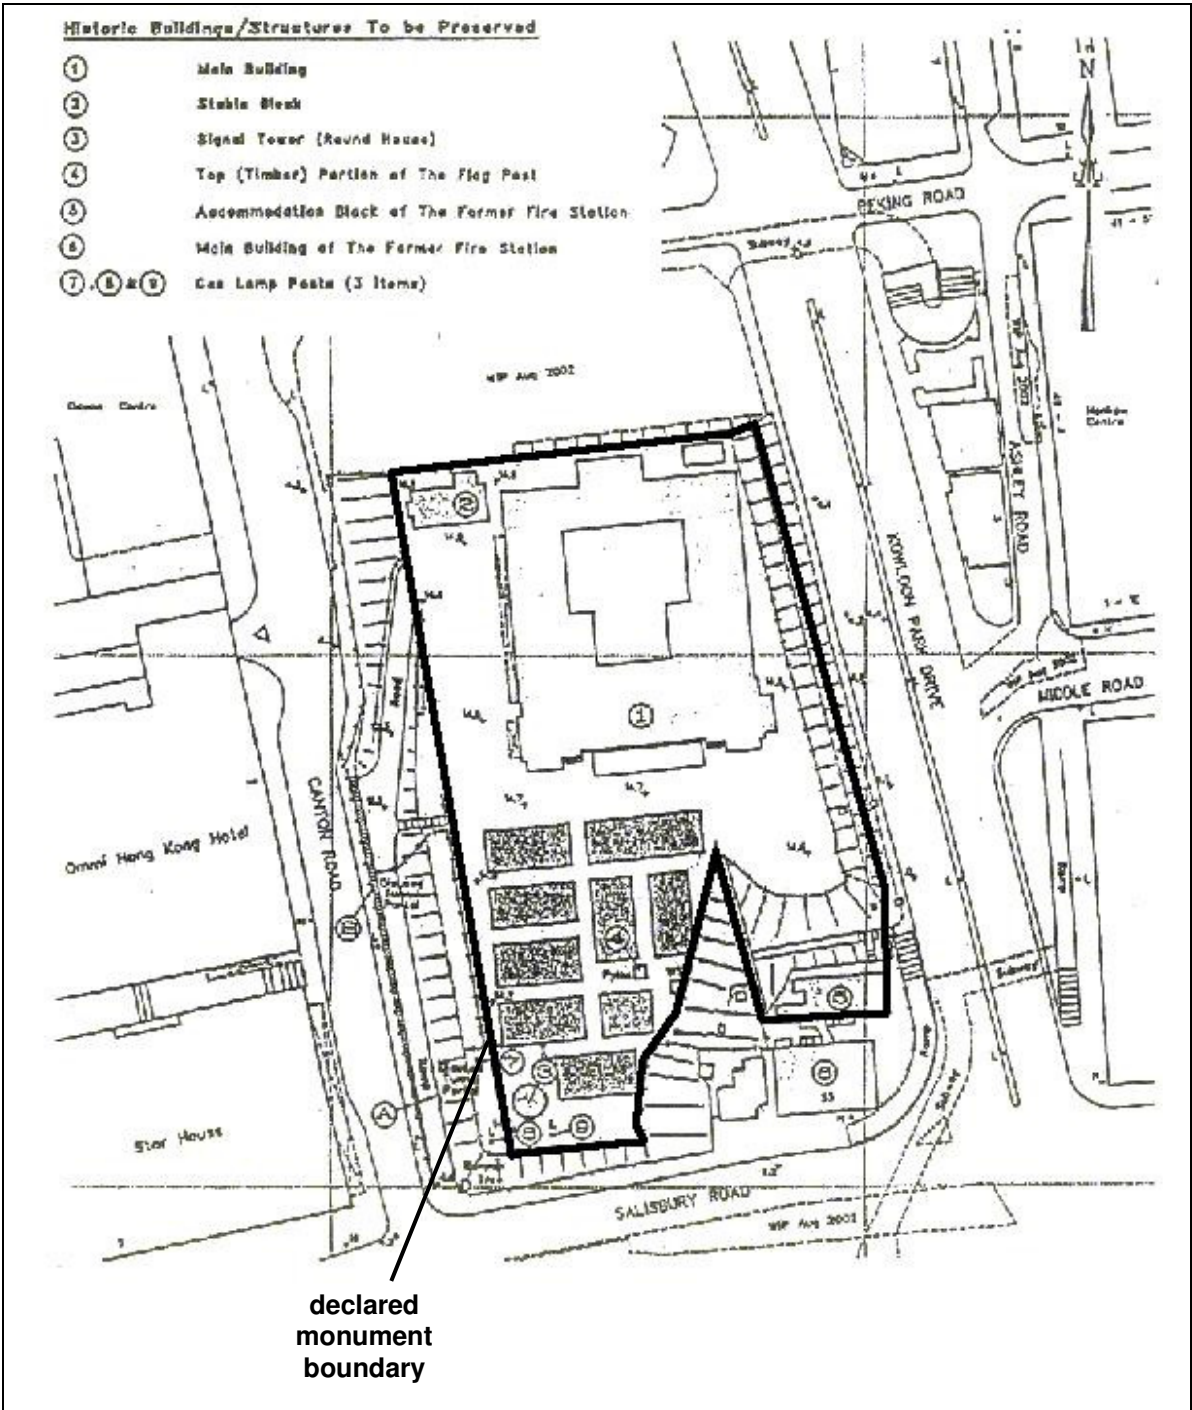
Location, site layout, historic buildings and structures to be preserved
